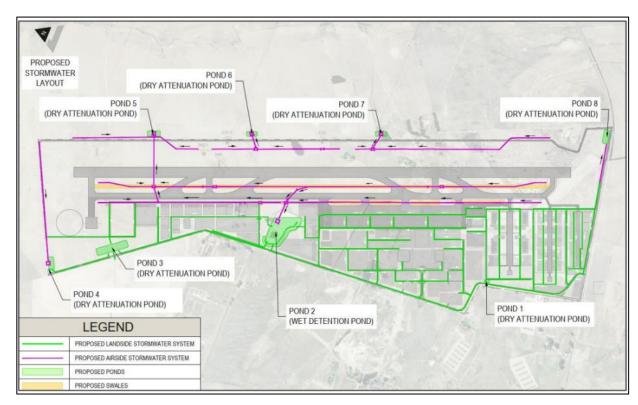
Proposed stormwater layout (Zutari, August 2024)
